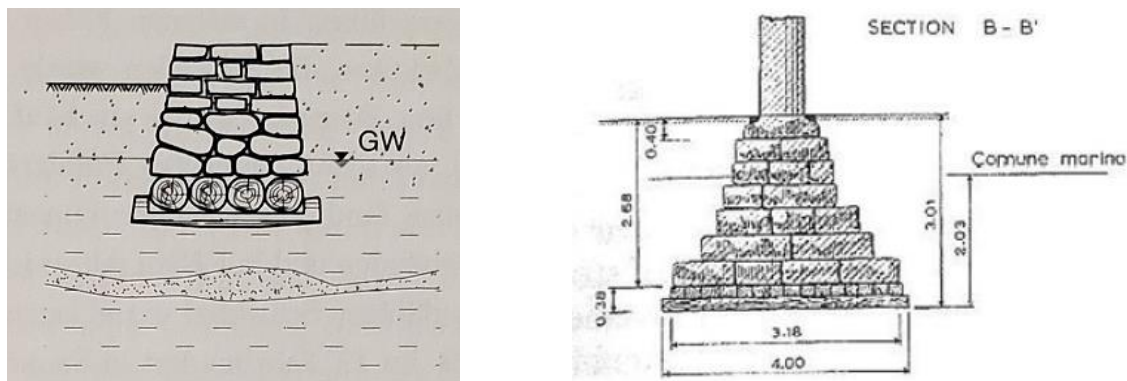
Examples of wooden shallow foundations, left: *Schwellengründung* (Jovanovic, 2002); right: wooden plank foundation of Palazzo Ducale by Malvezzi (1874) (Ceccato, 2011)
